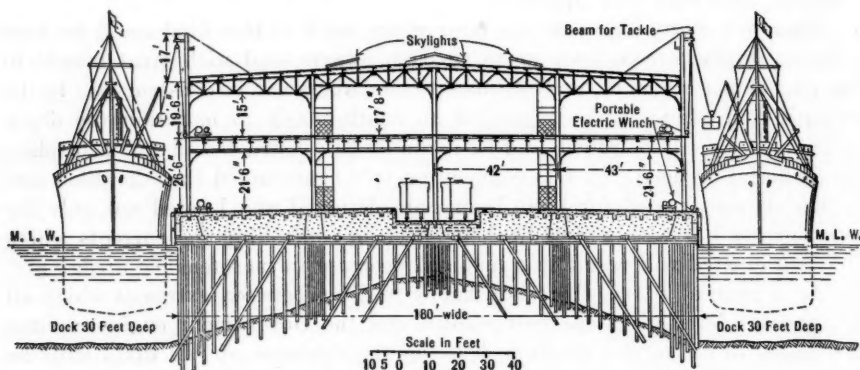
TYPICAL CROSS-SECTION, SOUTHWARK, PIERS, PHILADELPHIA, PA.
